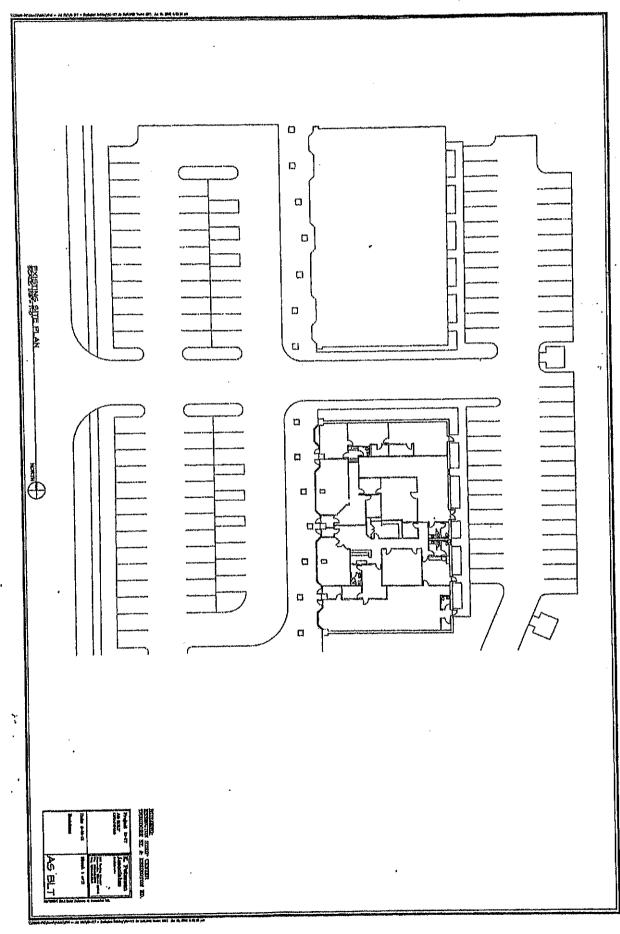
Commercial building and parking area at 1504 Essington Road (July 2024)
